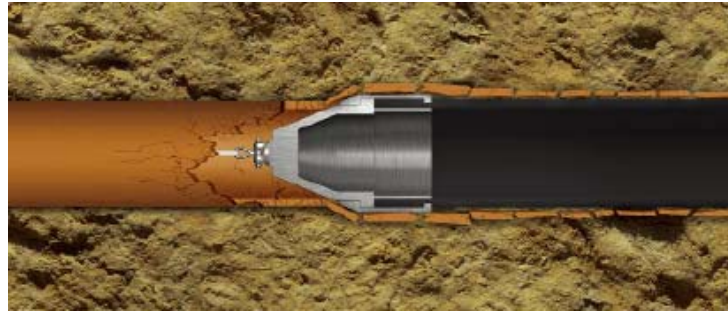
STATIC BURSTING HEAD (Graphic Courtesy of Miller Pipelines)
